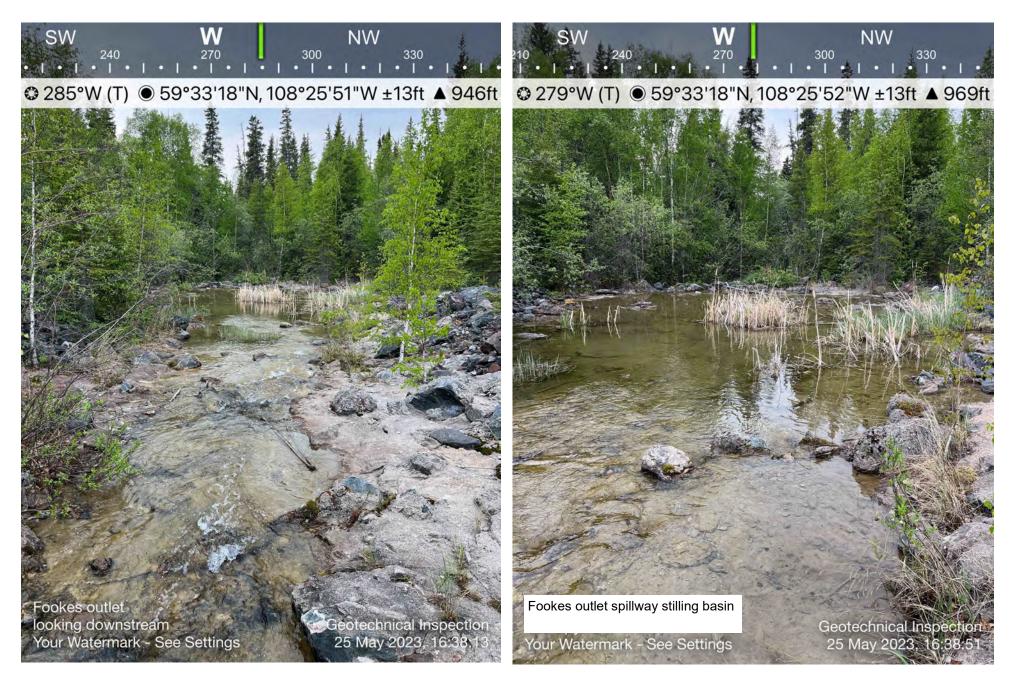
Fookes Reservoir Spillway looking downstream (mid channel)
